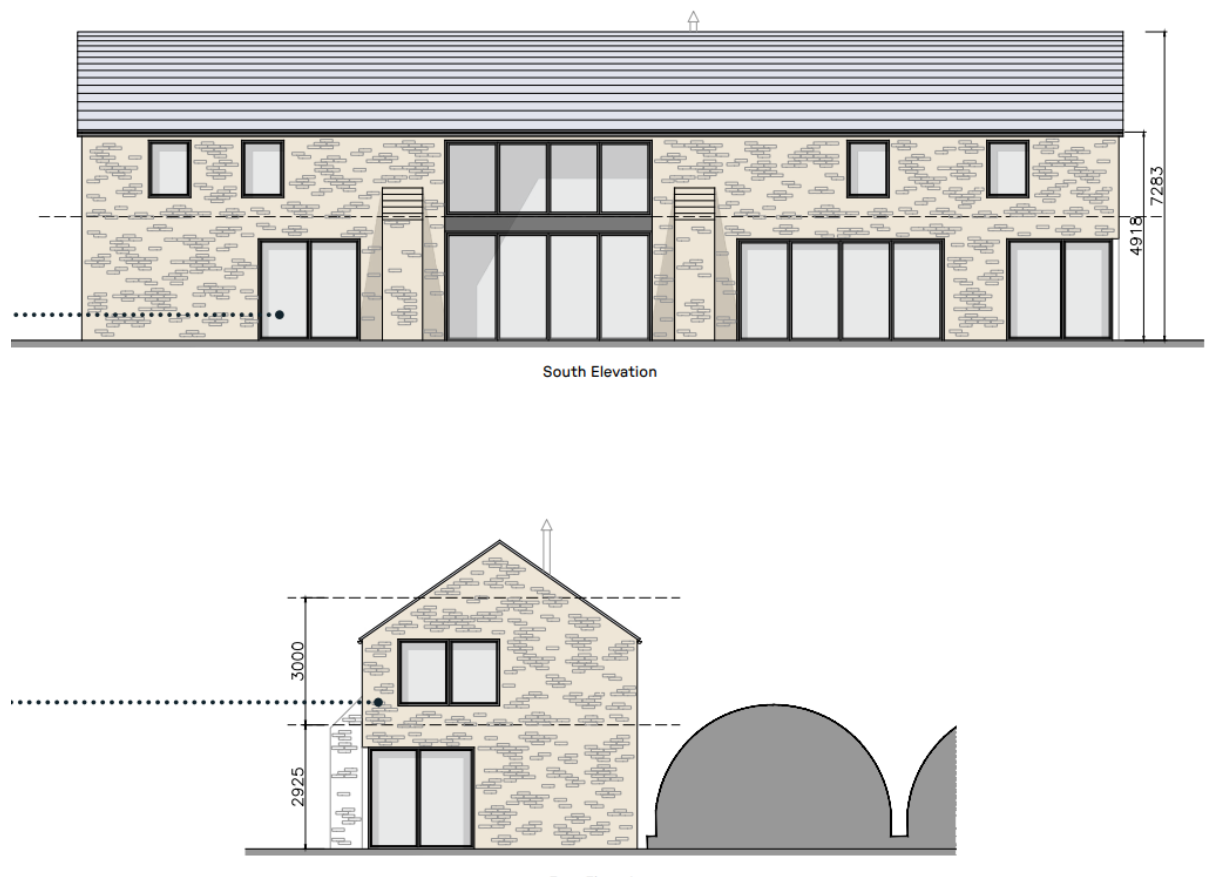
The two-storey dwelling southern and flank elevations approved on appeal.³
